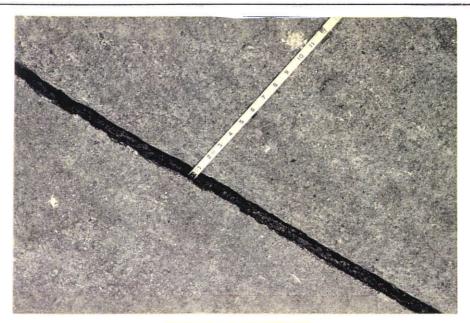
Retaining Wall at Circular Pathway -Detail of the Cracks on the Pathway (II)
